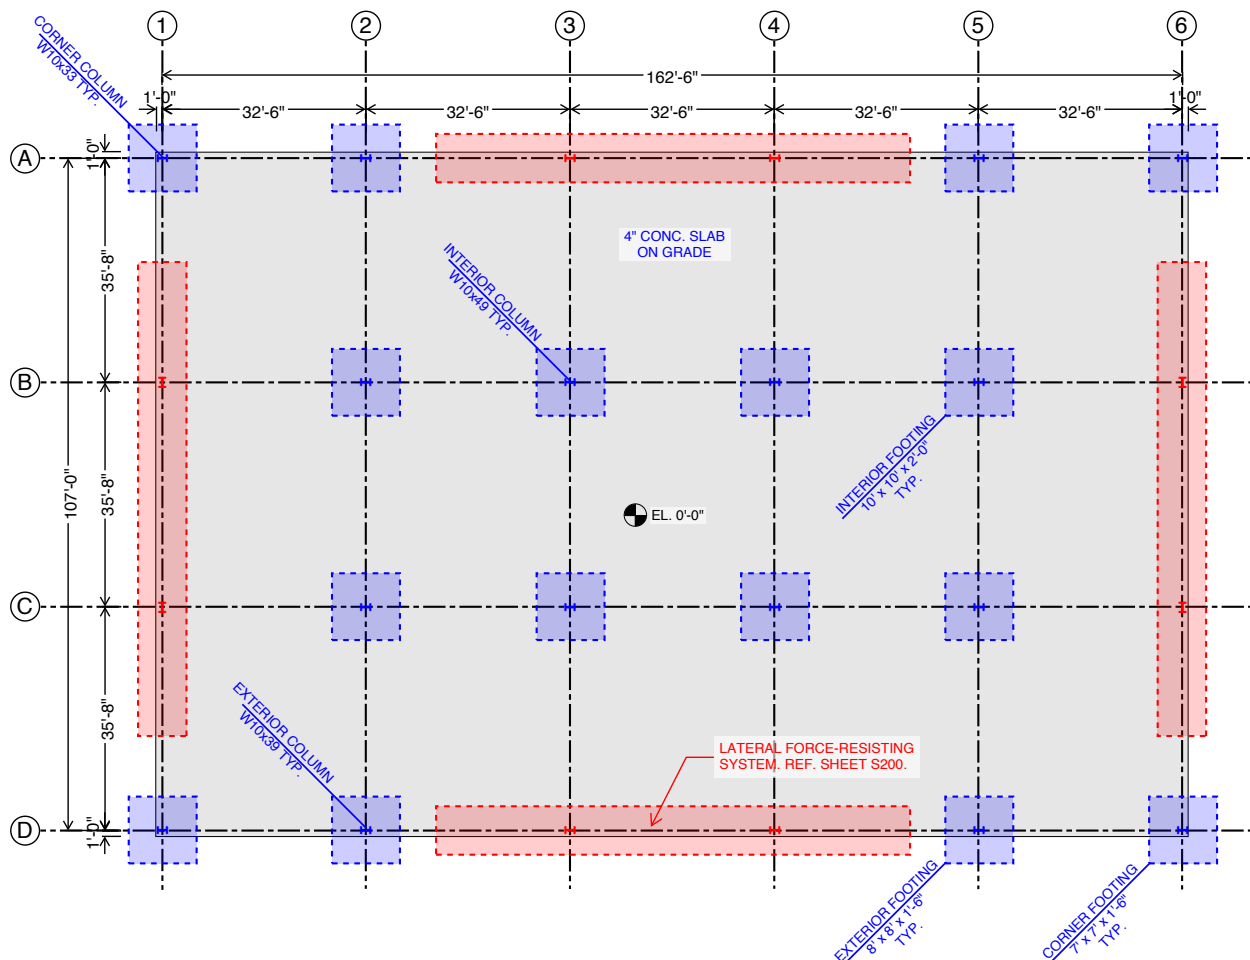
First floor and foundation plan for the medium structural steel office building
